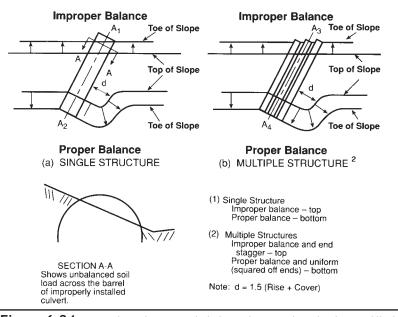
Properly and improperly balanced (warped) embankment fills for single and multiple culvert conditions.
